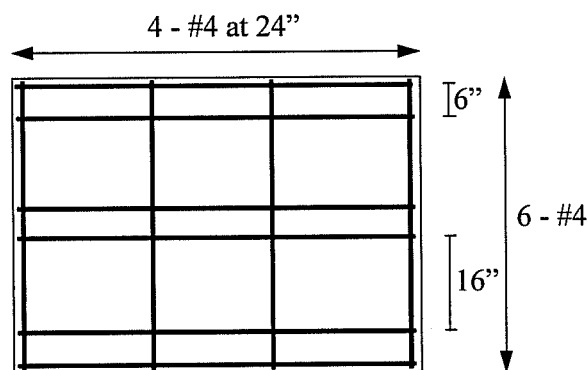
Location of Steel Reinforcement for Tension Tests - Plan View
